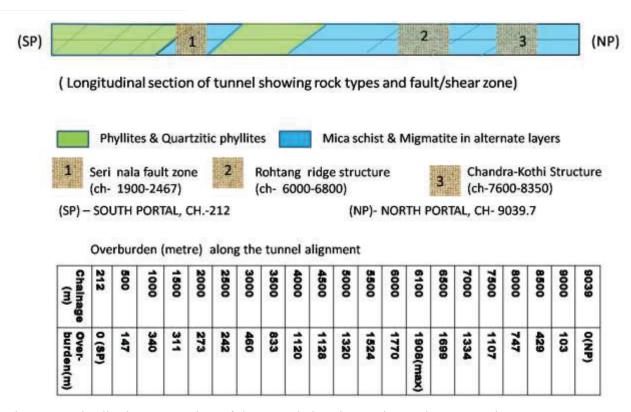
Longitudinal cross section of the tunnel showing major rock types main structures along the alignment and overburden along the tunnel alignment
